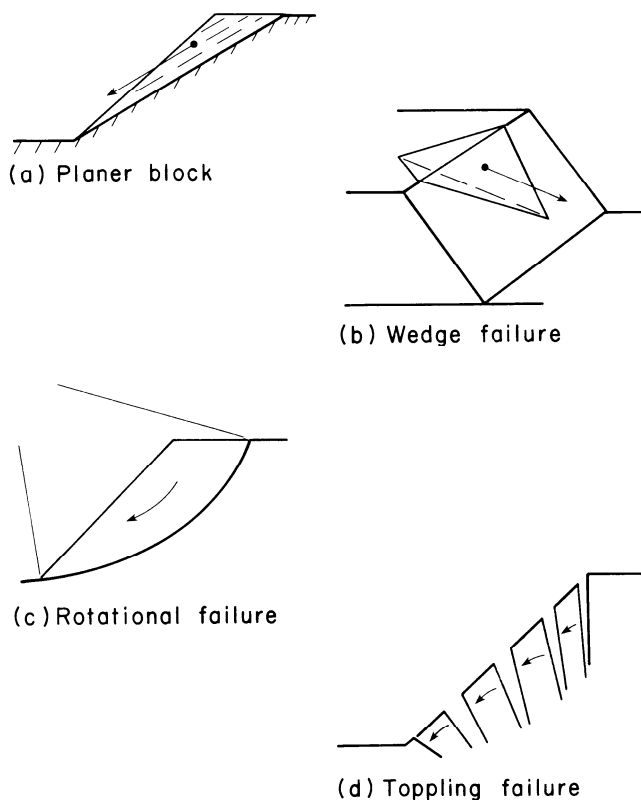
Basic types of rock slope failures. (a) Planer block, (b) wedge failure, (c) rotational failure, (d) toppling failure.
